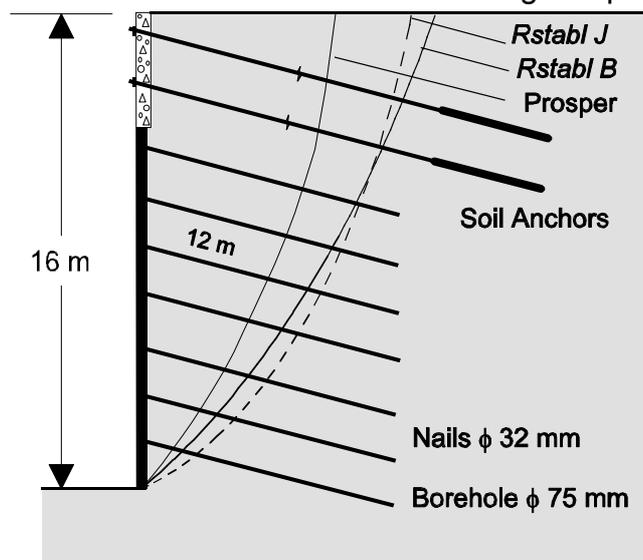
Mixed soil nailing structure proposed for an excavation in medium sandy-silt
